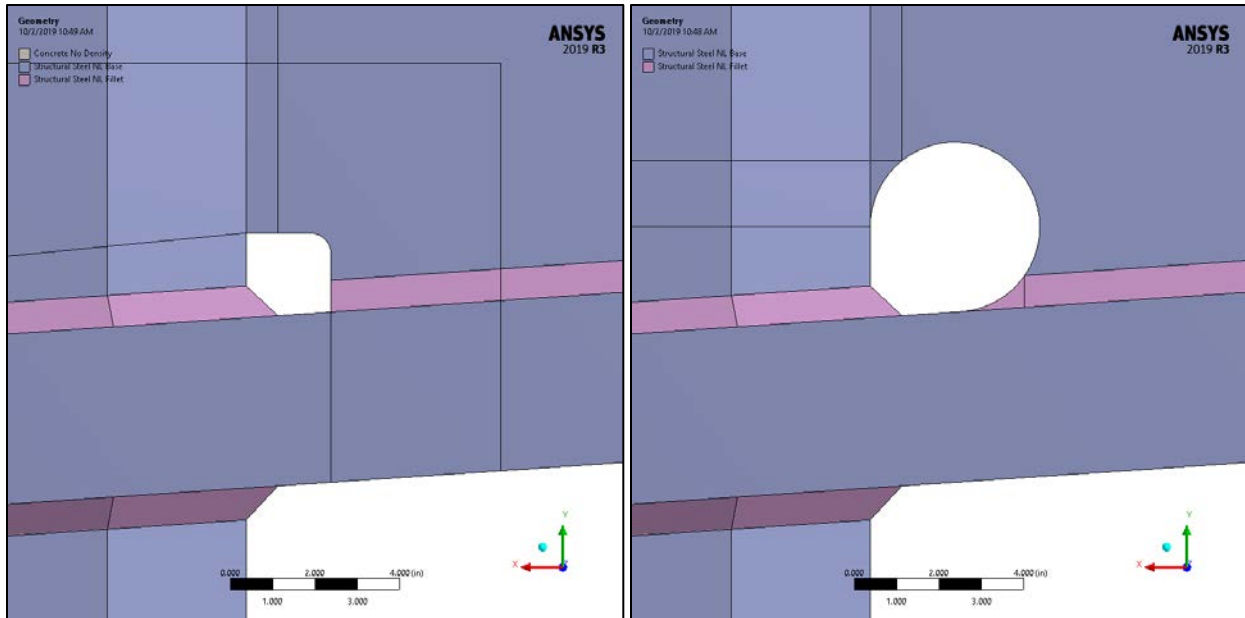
As-built geometry (left) and drilled web access hole (right).
